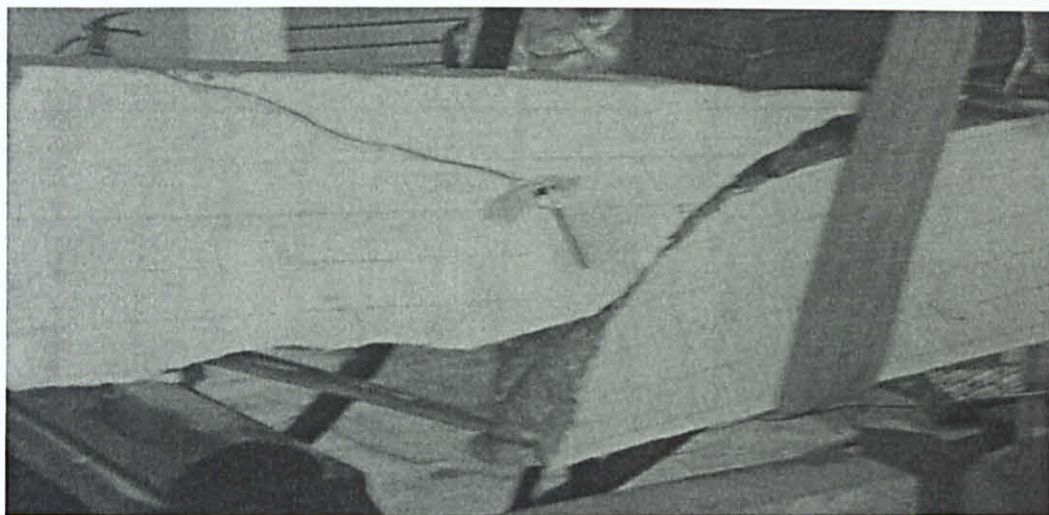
Failure of control beam at support by shear failure. Bottom Reinforcement Bar (Y12) bent.
